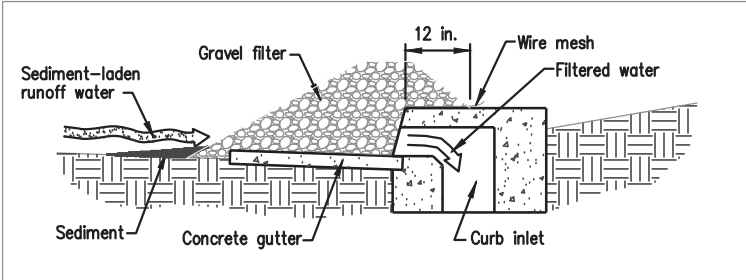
C. Cross-section detail of a gravel curb inlet protection.
